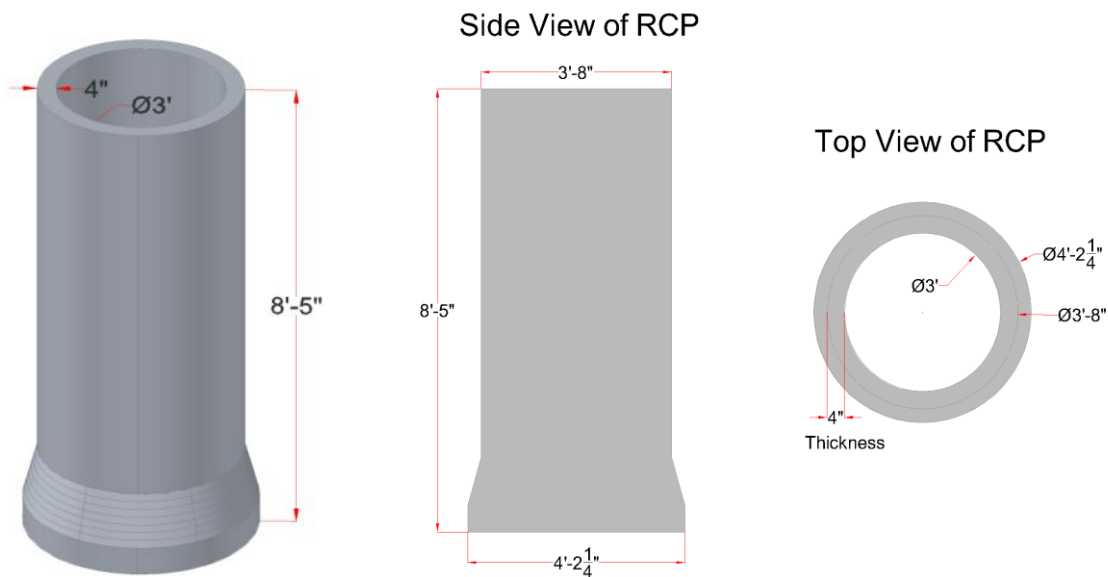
3-D, side, and top view of the reinforced concrete pipe.
